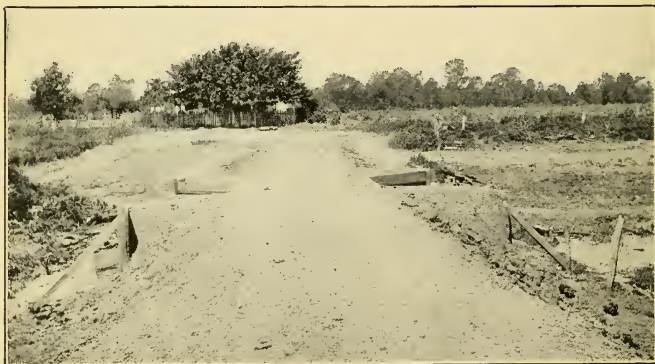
View across Bayou Walnut at site of dam, showing roadway to opposite side of bayou.
